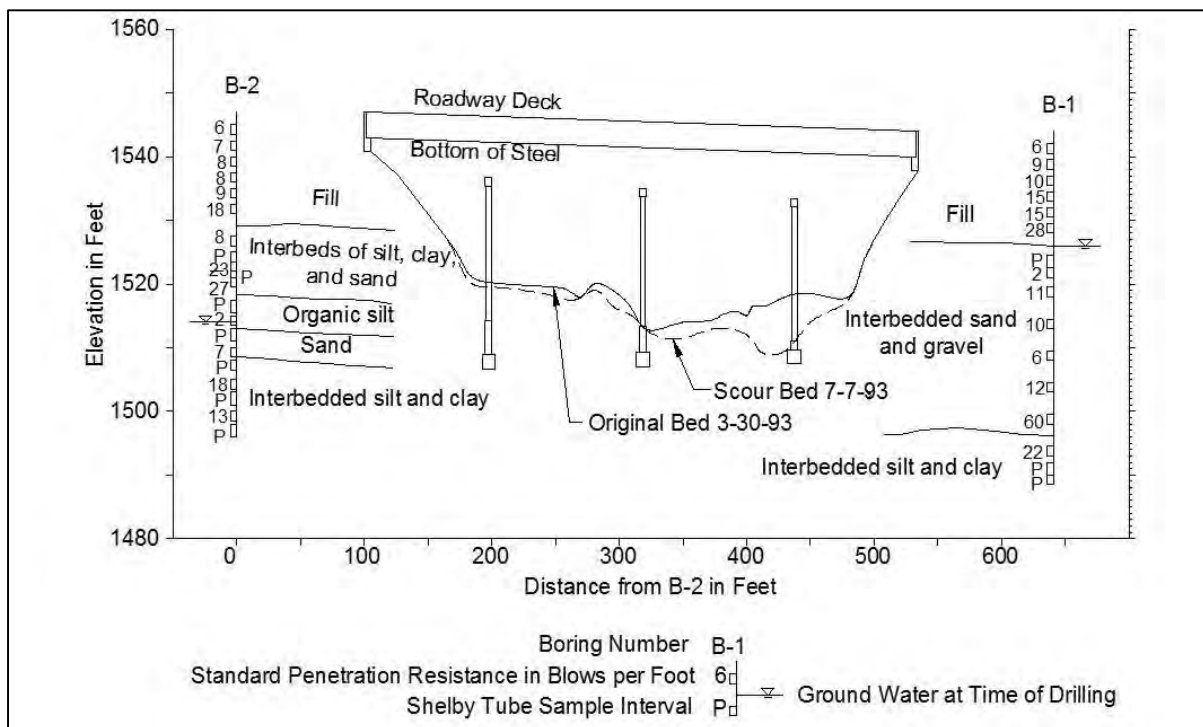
shows the generalized subsurface conditions at the bridge site. Two borings were completed on the north and south abutments on June 12, 2007. Sampling with standard penetration testing (SPT) was performed from the ground elevation to the foundation elevation to delineate the soil stratigraphy. Thin wall tube samples were collected at selected depths from each drill hole for soil erosion rate testing. The general site soil materials that were observed during drilling included about 15 ft. of loose to medium dense fill soils overlying alluvial soils consisting of inter-bedded layers of silts, clays, and sands. At a depth of about 20 ft., black organic silt was encountered at the south abutment. Coarser grained materials were observed at the north abutment.
